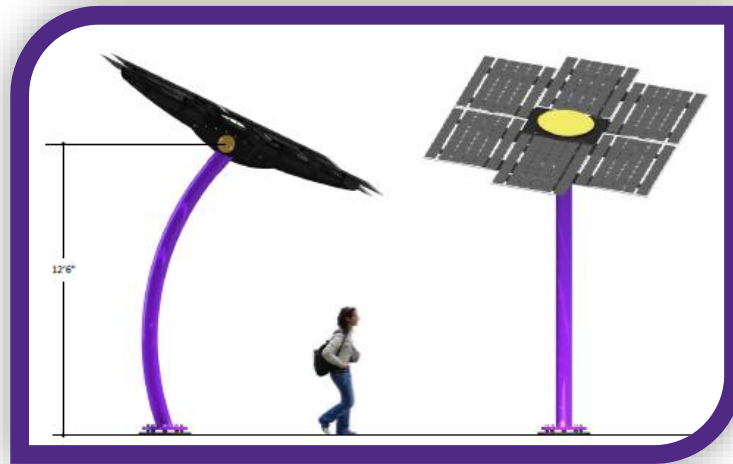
Elevated installation ensures out of the way and great view of the sky over Lewis Hall
